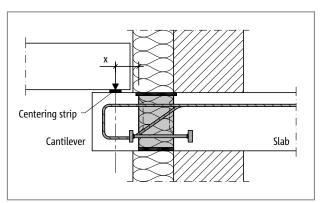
Schöck Isokorb® XT type O: Connection of a console as floor support; centring battens prevent a displacement of the load application point
